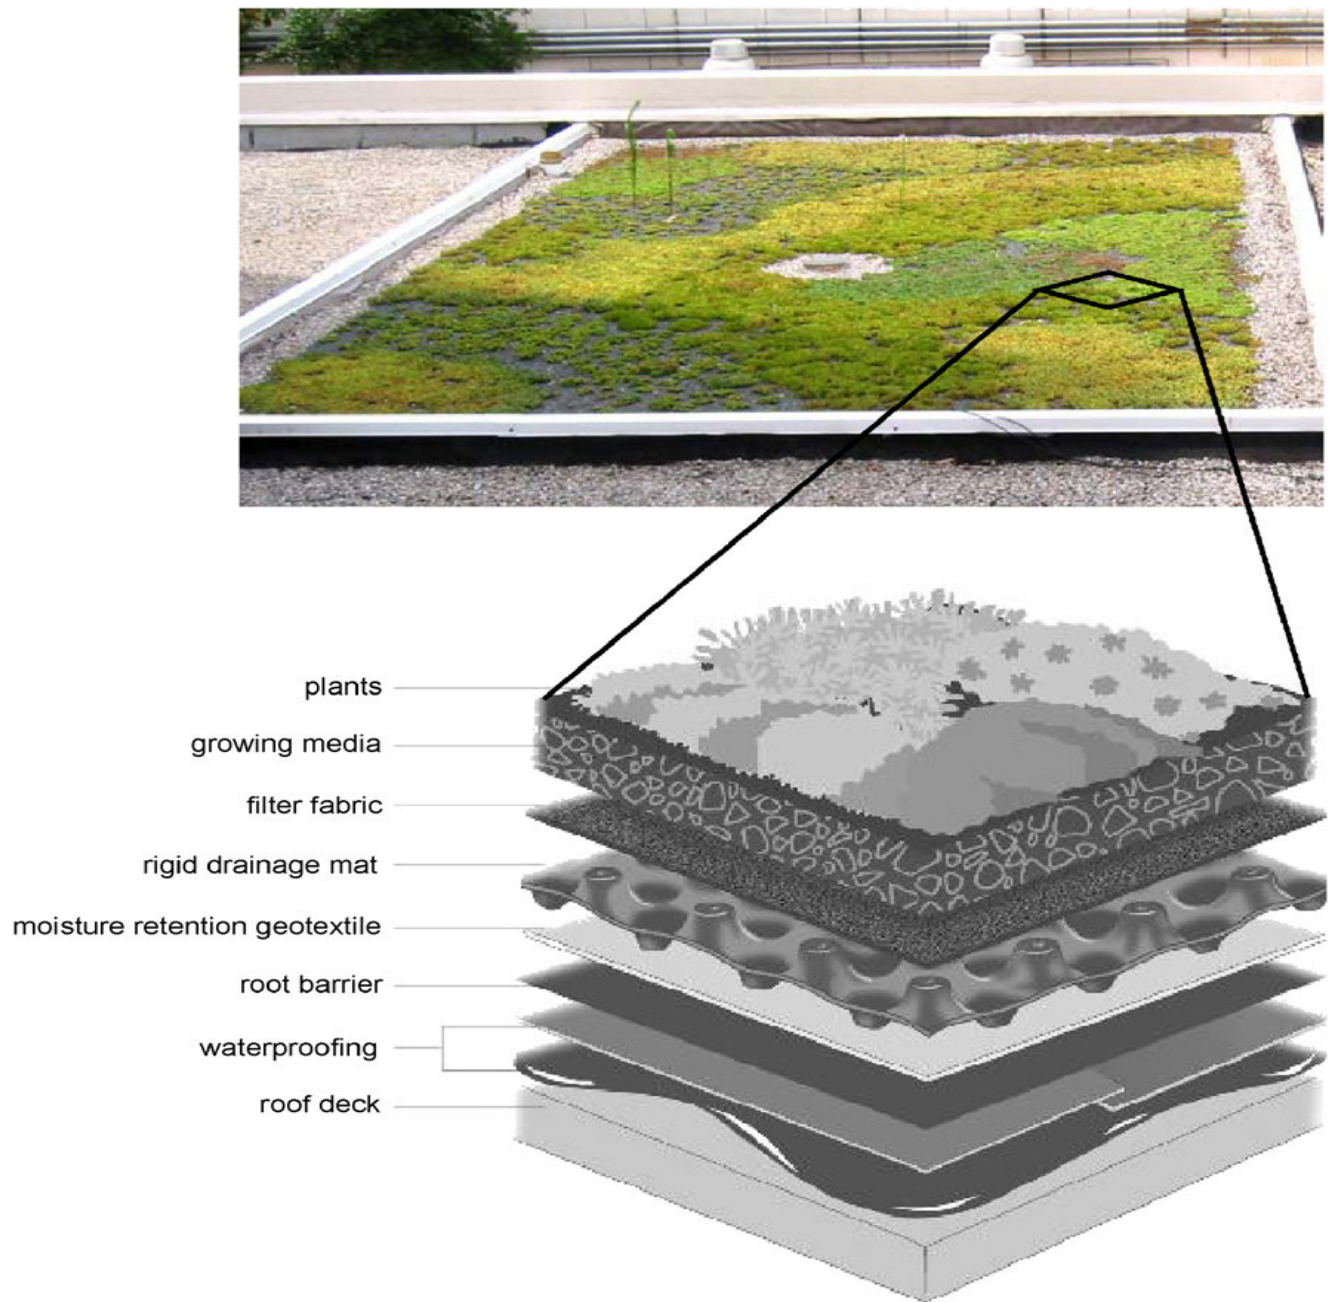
Green roof test plot and layer cross-section (Carter 2006)
